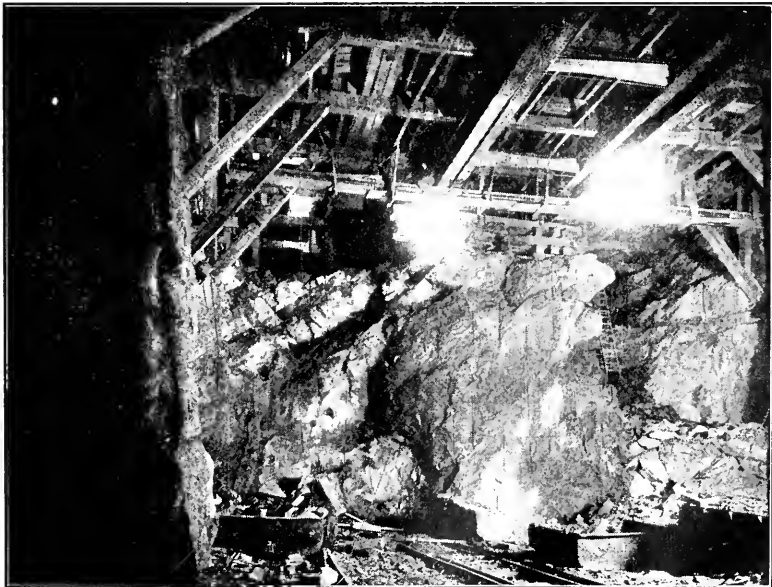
WORKING FACE UNDER LONG SPAN WITH NO POSTS.
